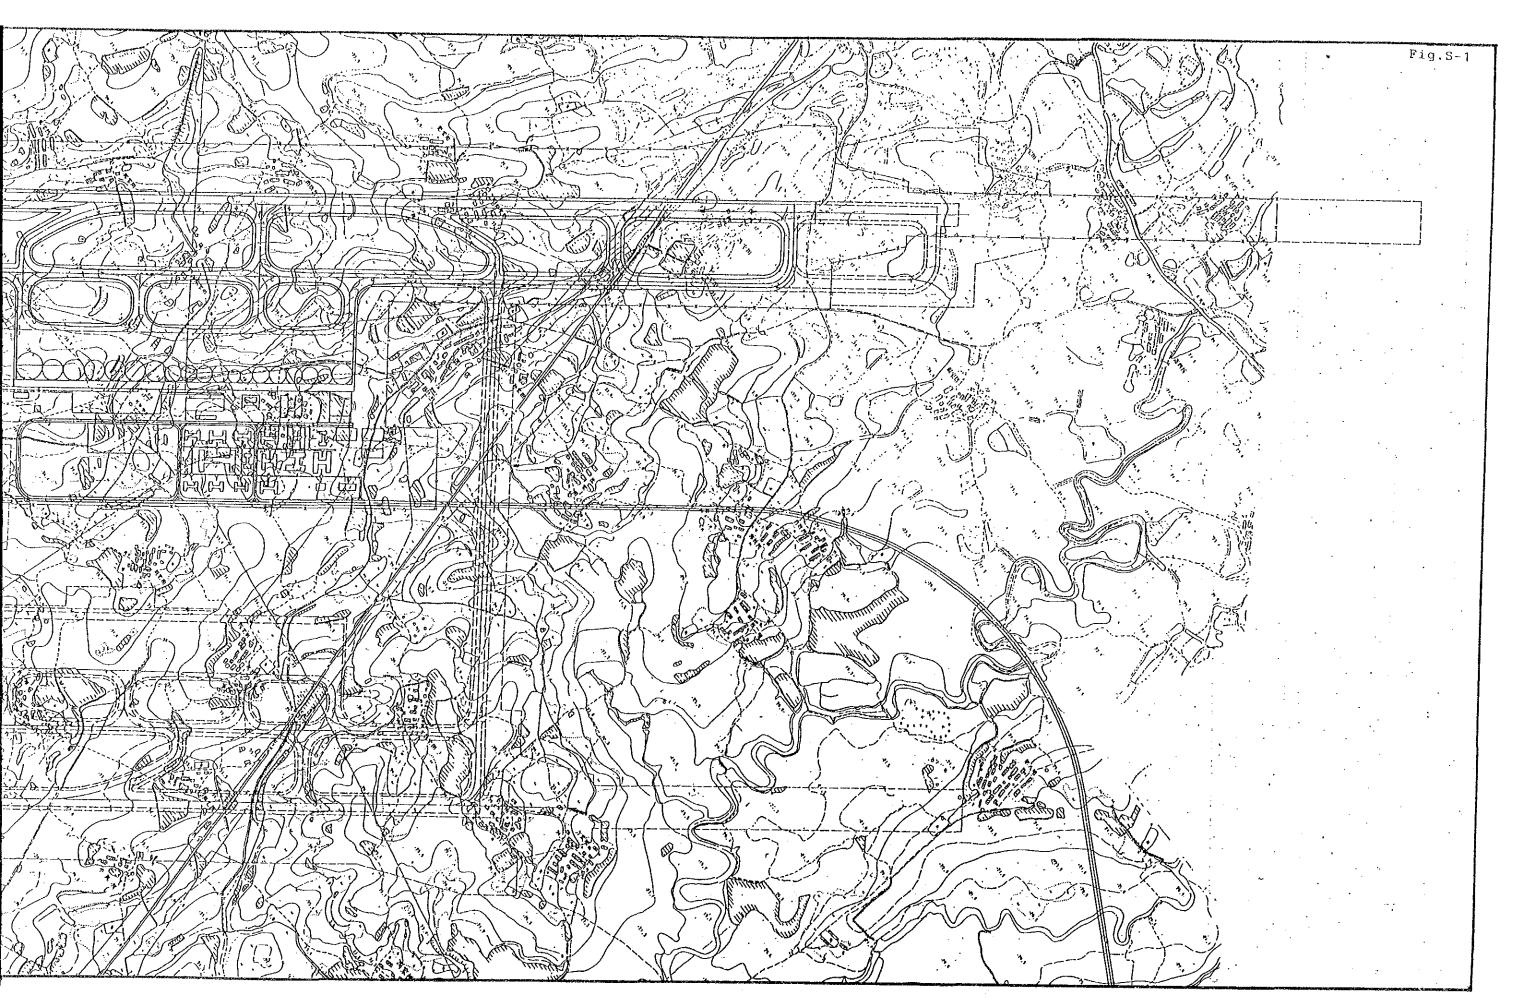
Overall Layout Plan of Airport Facilities - vii -
